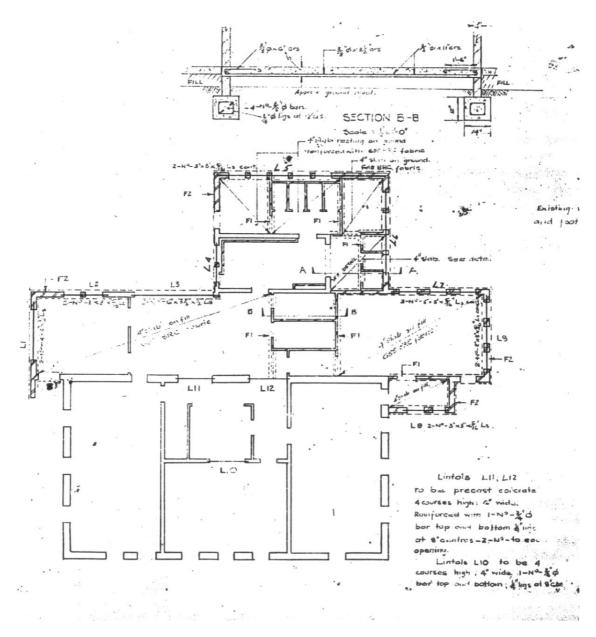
1954 plan showing proposed extension to M2. Source: Department of Public Works, *Kew Mental Hospital Childrens Cottages Ward M2 Proposed extension* 12.12.54, BSA Drawings MHK 1.590 (PROV).
